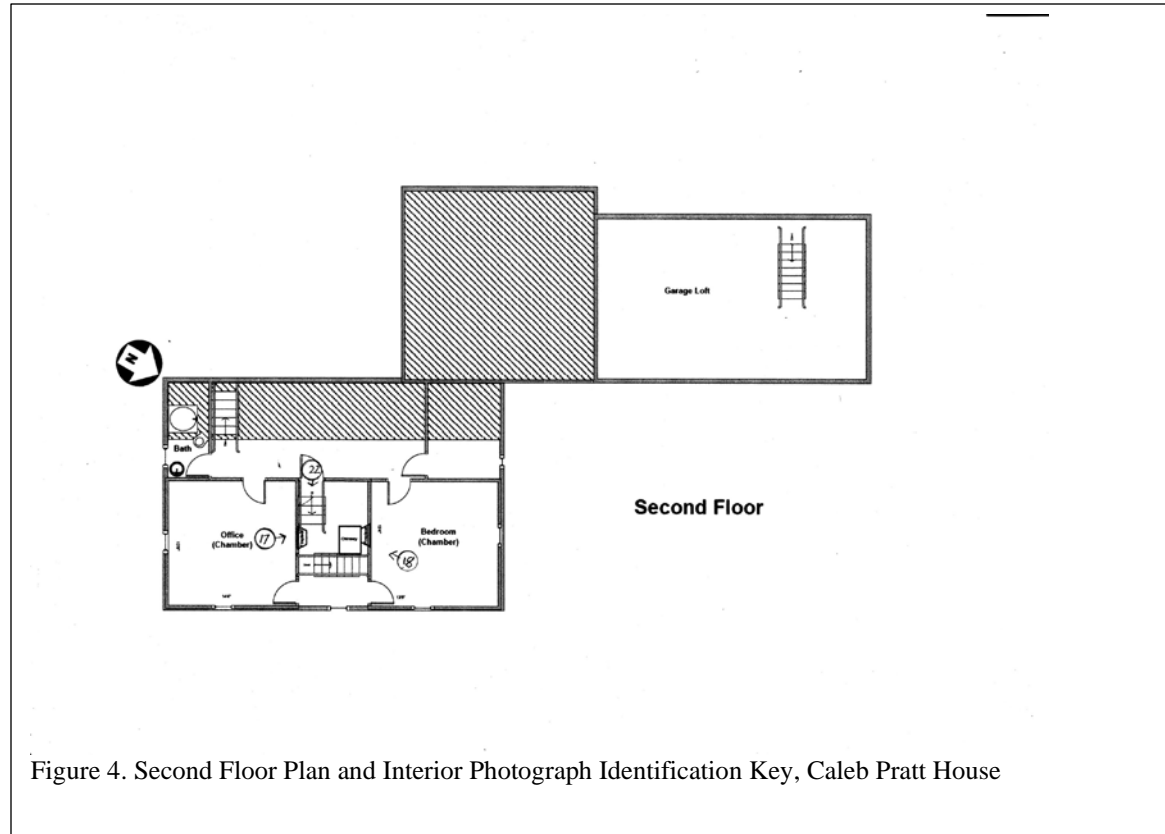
Second Floor Plan and Interior Photograph Identification Key, Caleb Pratt House
